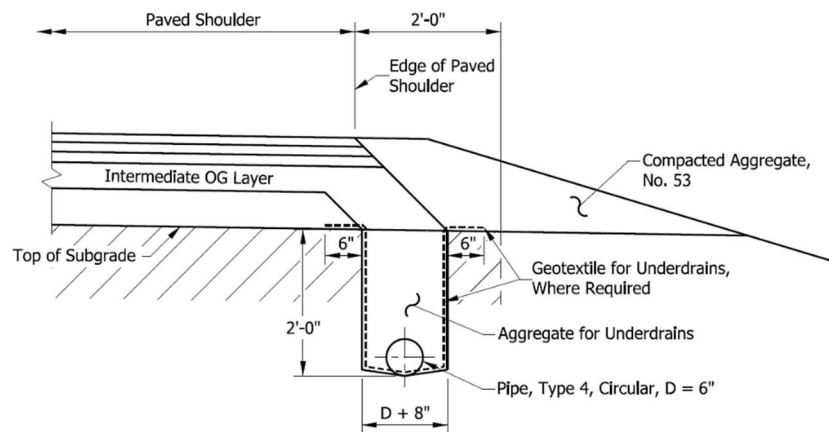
Typical pavement drainage system components (Huang, 1993)
